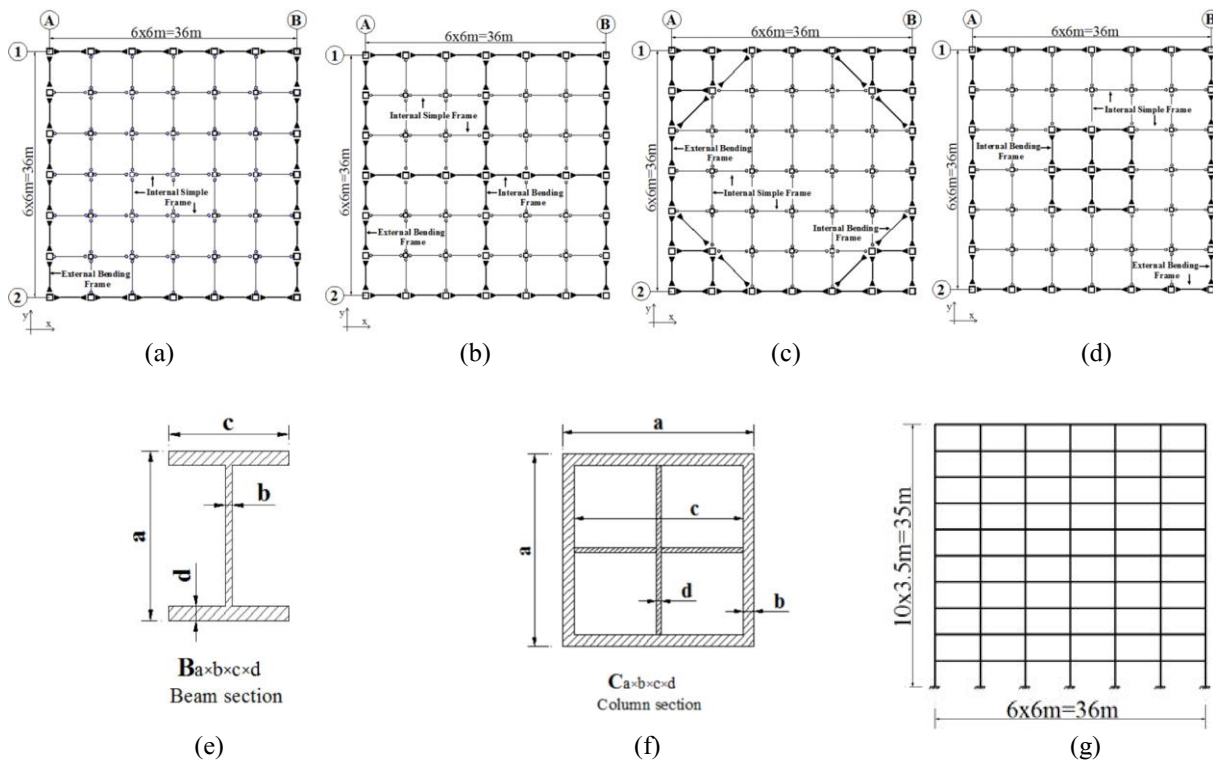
The structural models: (a) Plan of Framed tube; (b) Plan of Bundled tube; (c) Plan of Castled tube; (d) Plan of Cellular tube; (e) Columns section property of 10-storey models; (f) Beams section property of 10-storey models; (g) The 10-story configuration.
